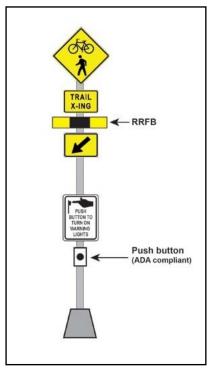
Rectangular Rapid Flashing Beacon (RRFB)
